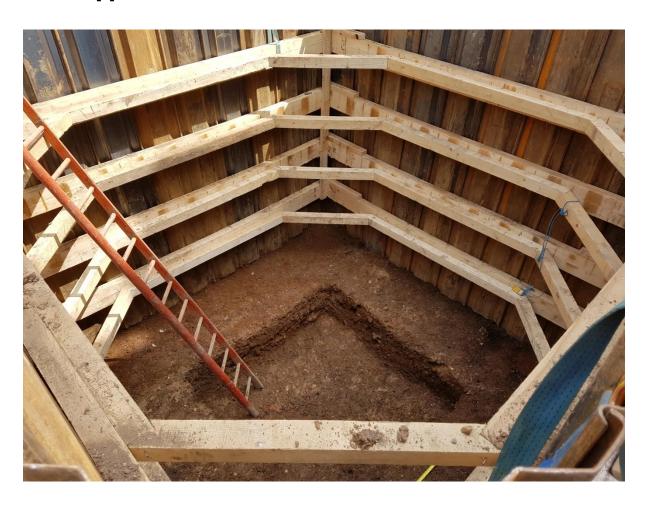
TRENCH 3 FACING SOUTH SHOWING POST-MEDIEVAL DUMP DEPOSIT [5] AT THE LIMIT OF EXCAVATION
